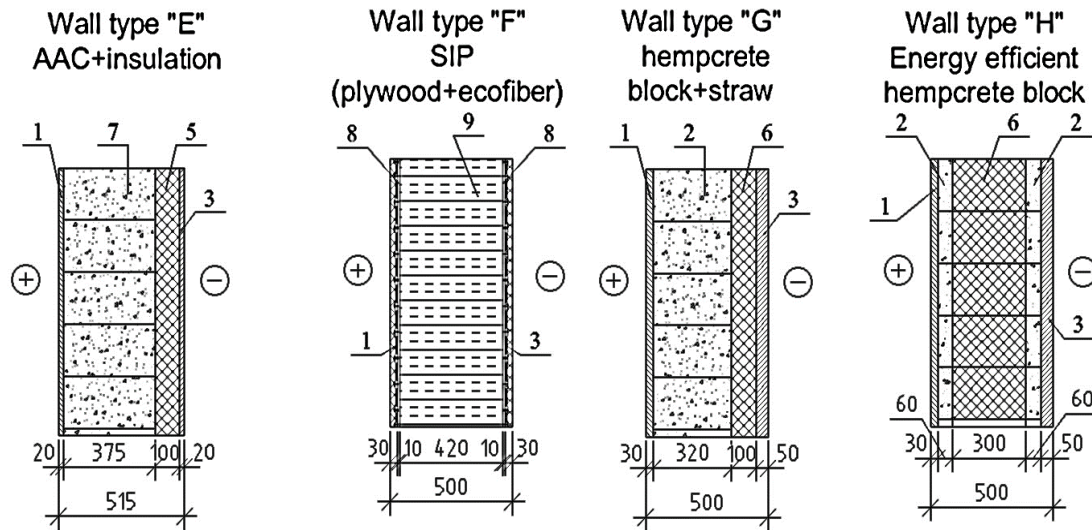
Considered wall types compositions «E»-«H» (1 – internal lime-sand plaster, 2 – hempcrete, 3 – external lime-sand plaster, 4 – honeycomb brick, 5 – mineral wool, 6 – strawbale panel, 7 – autoclaved aerated concrete (AAC), 8 – plywood, 9 – ecofiber)
